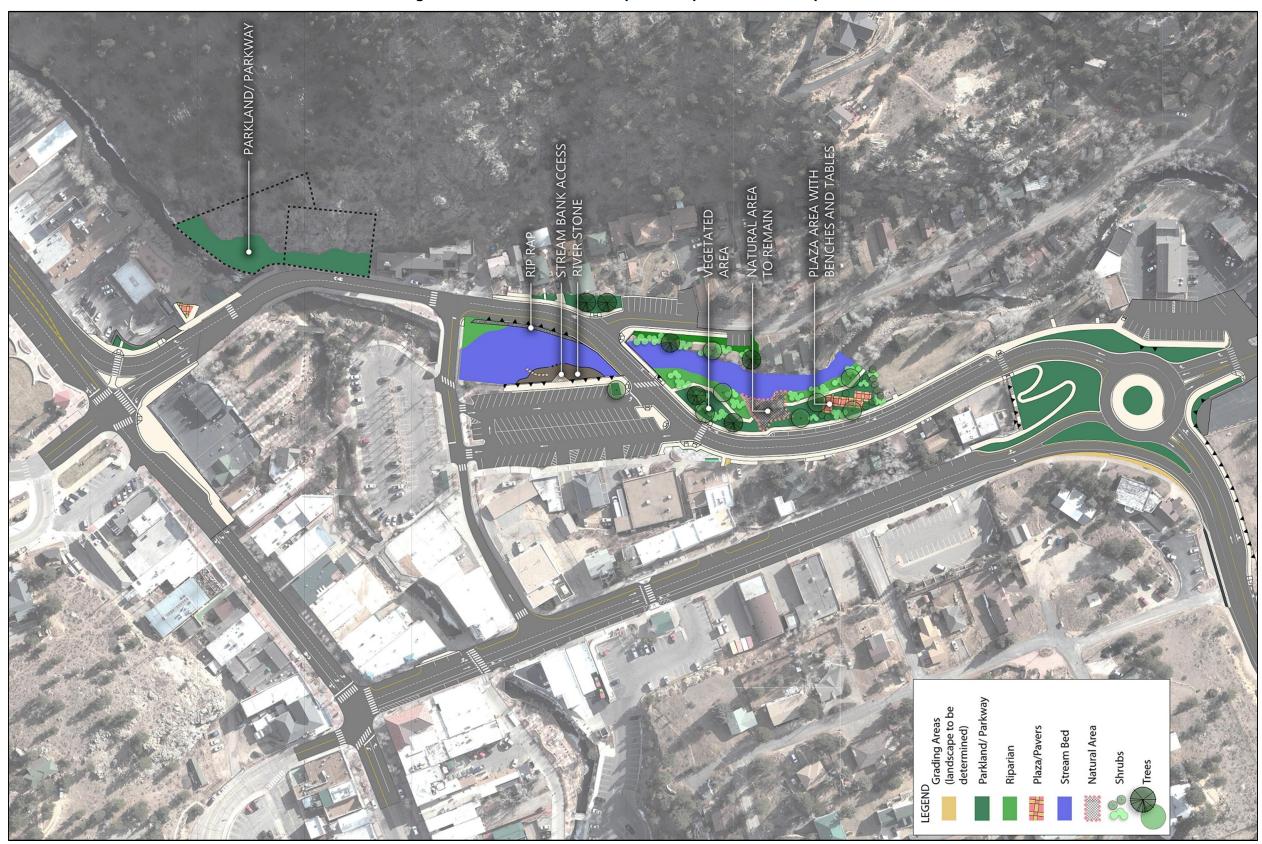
Downtown Estes Loop Park Replacement Concept Plan
